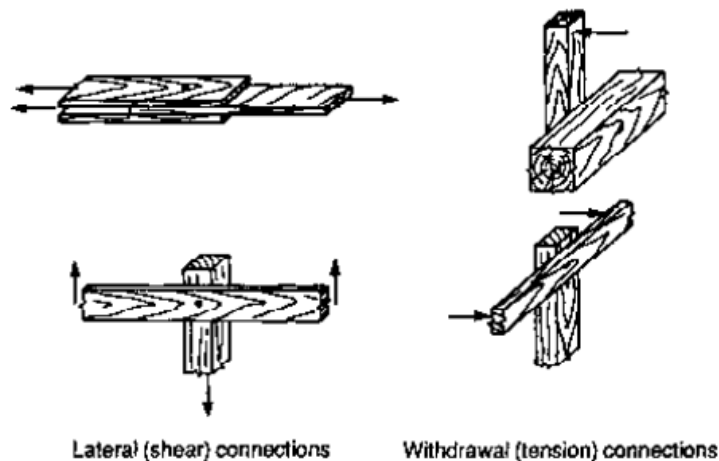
Most common types of connections used in bridge construction (Volik 2005)
